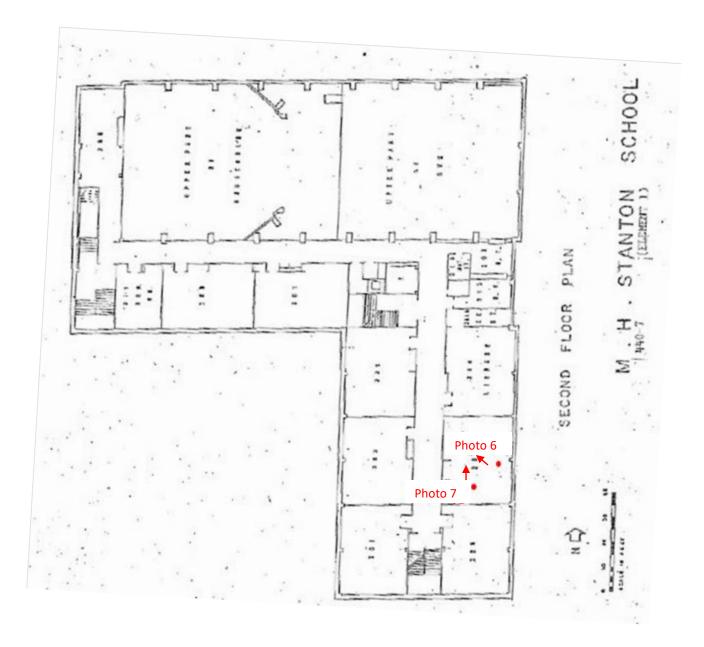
Second Floor Plan, showing location of interior photos 6 and 7.
